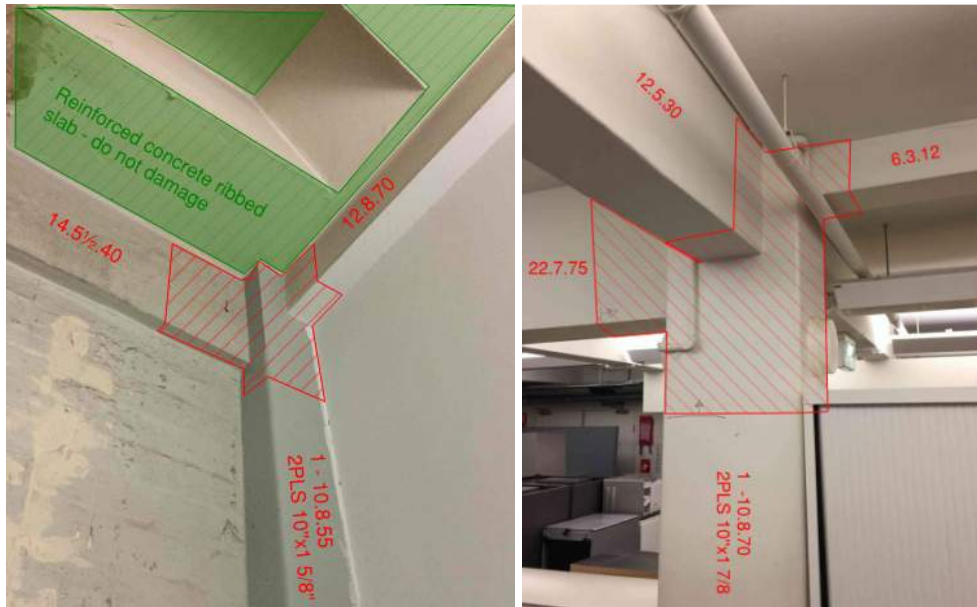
TC4 (left) TC6 (right) column/beam locations with member sizes
